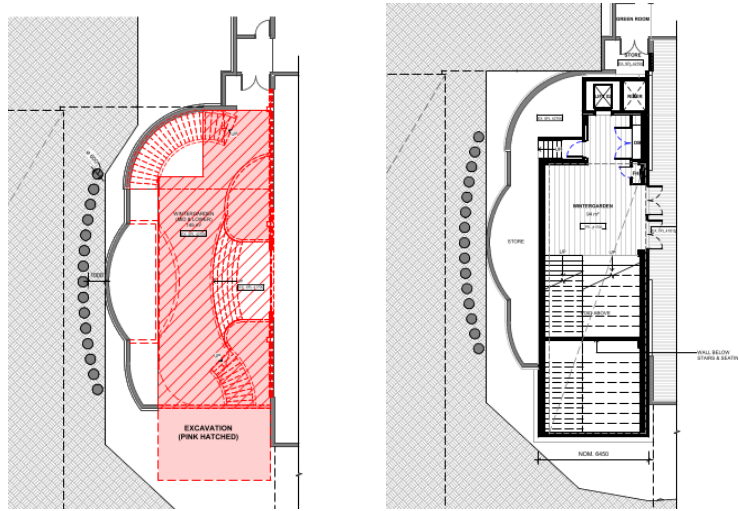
Lower Wintergarden foyer (existing left) and (proposed right)
